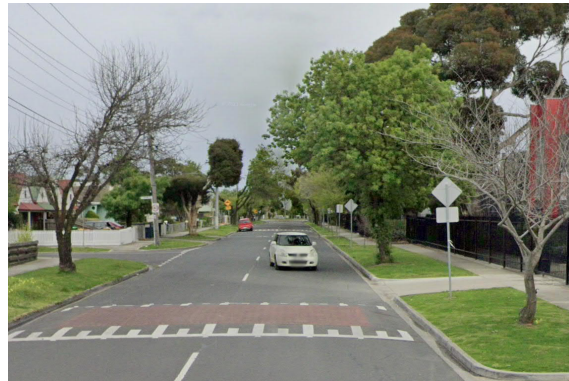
Darnley Street (facing south adjacent the proposed site access)
